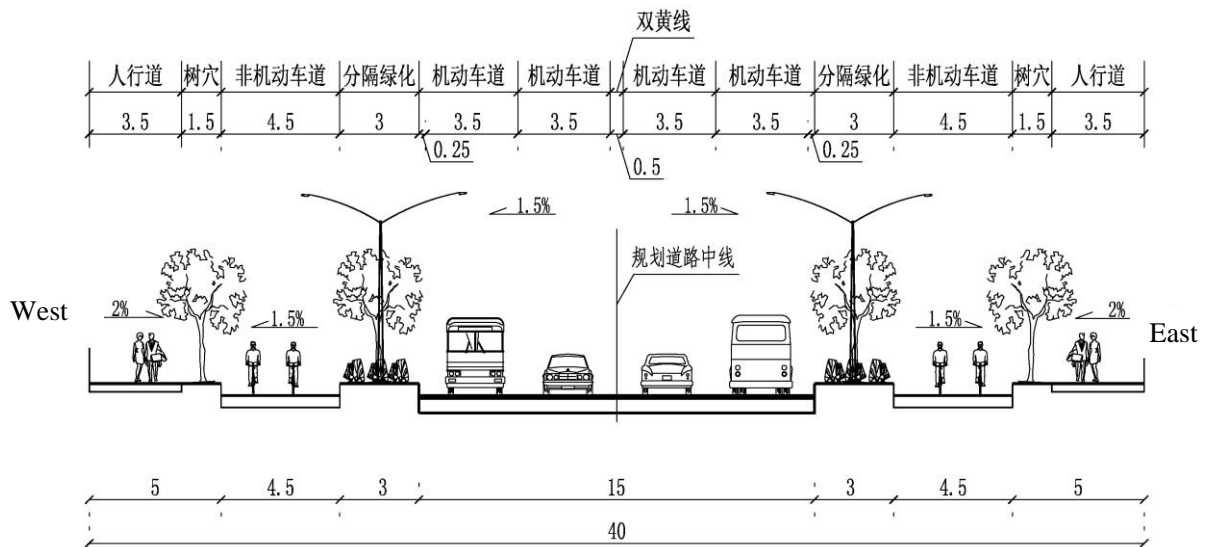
Standard Cross-section Scheme 2 for Zhanqian Road (Connecting Line of the Third Bridge to Anlu-Beijing Line)
